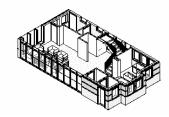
Architectural Space or Rooms Representations (2<sup>nd</sup> floor)
